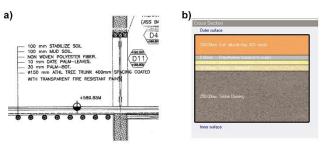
First floor layer: a) as built detail, b) design builder data entry ground layer.
